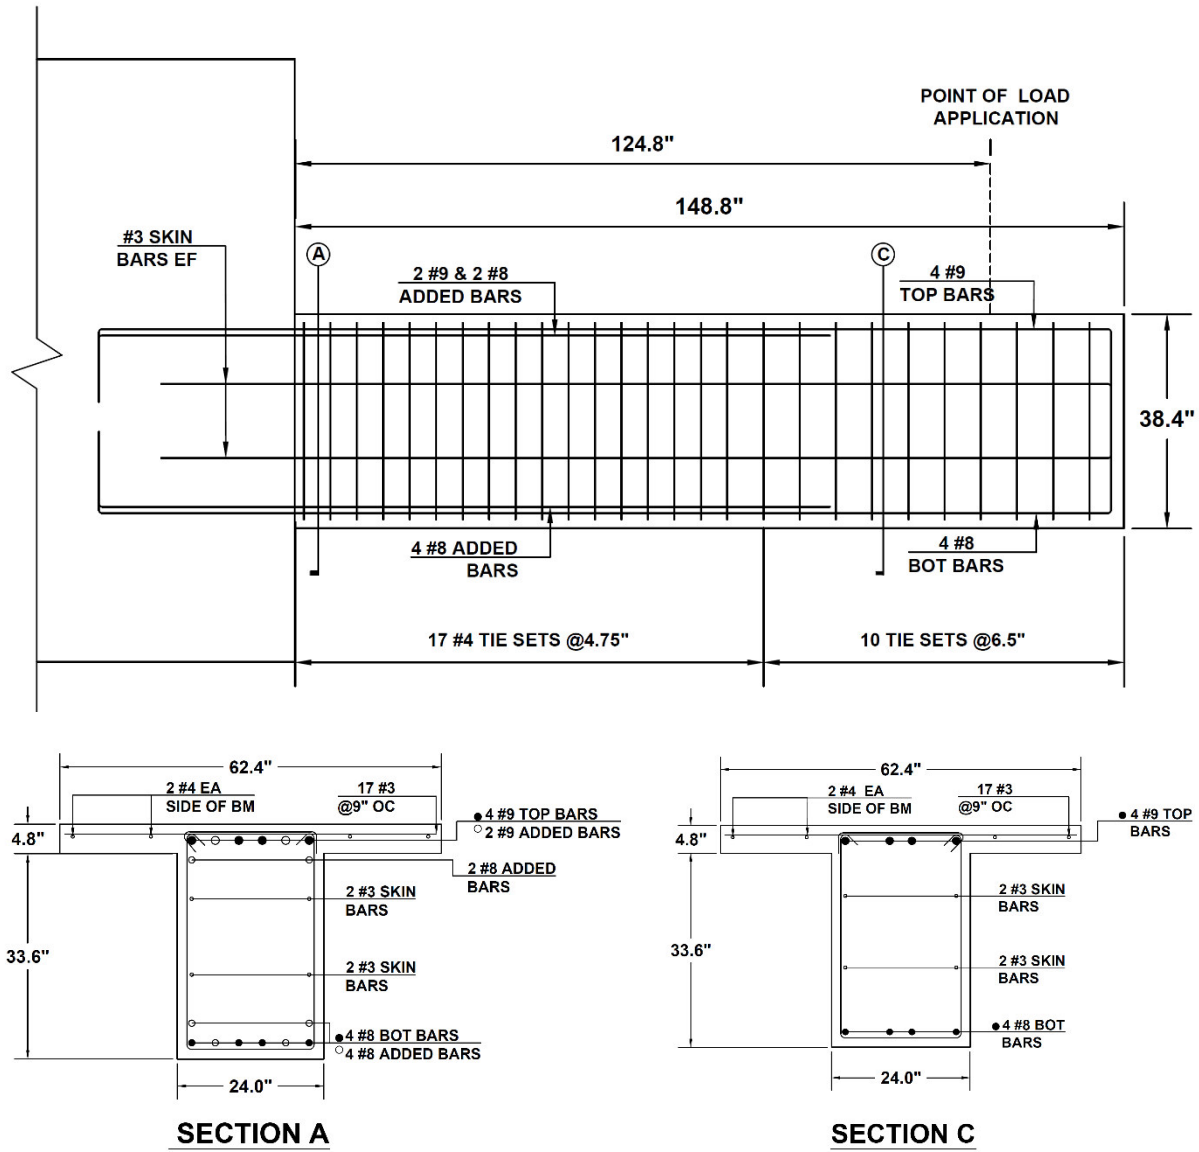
Beam elevation geometry and reinforcement details for S4
